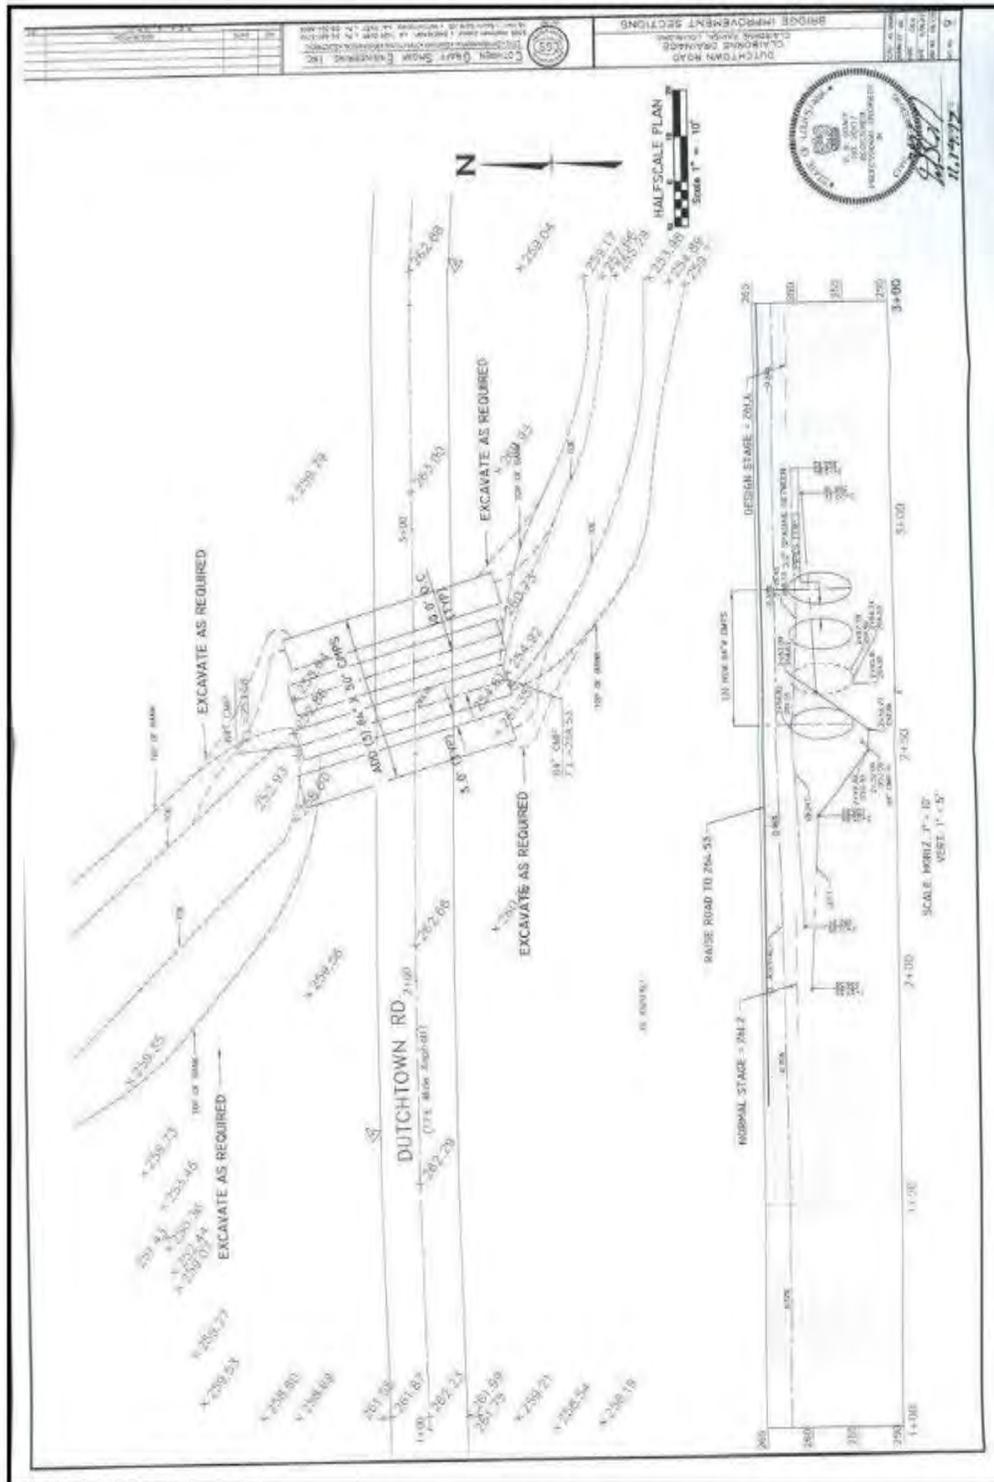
Construction plans for the proposed Dutchtown Road in PA 3 (Cothren, Graff, Smoak Engineering, Inc. 11/6/12).
